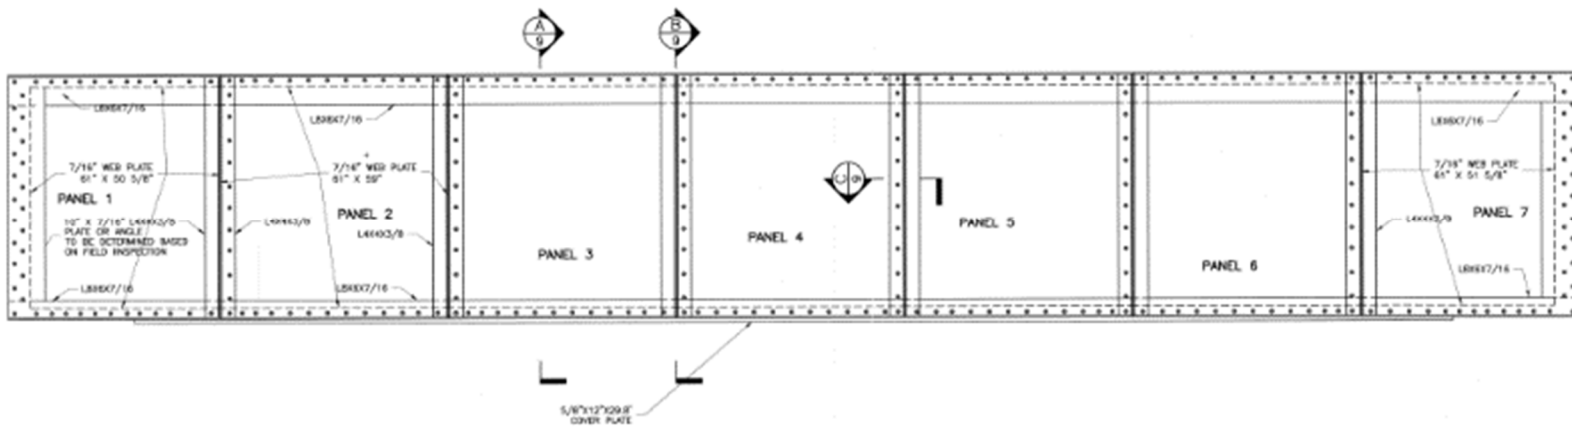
Floor Beam Repair, Elevation View (2014 Repair Plans)
